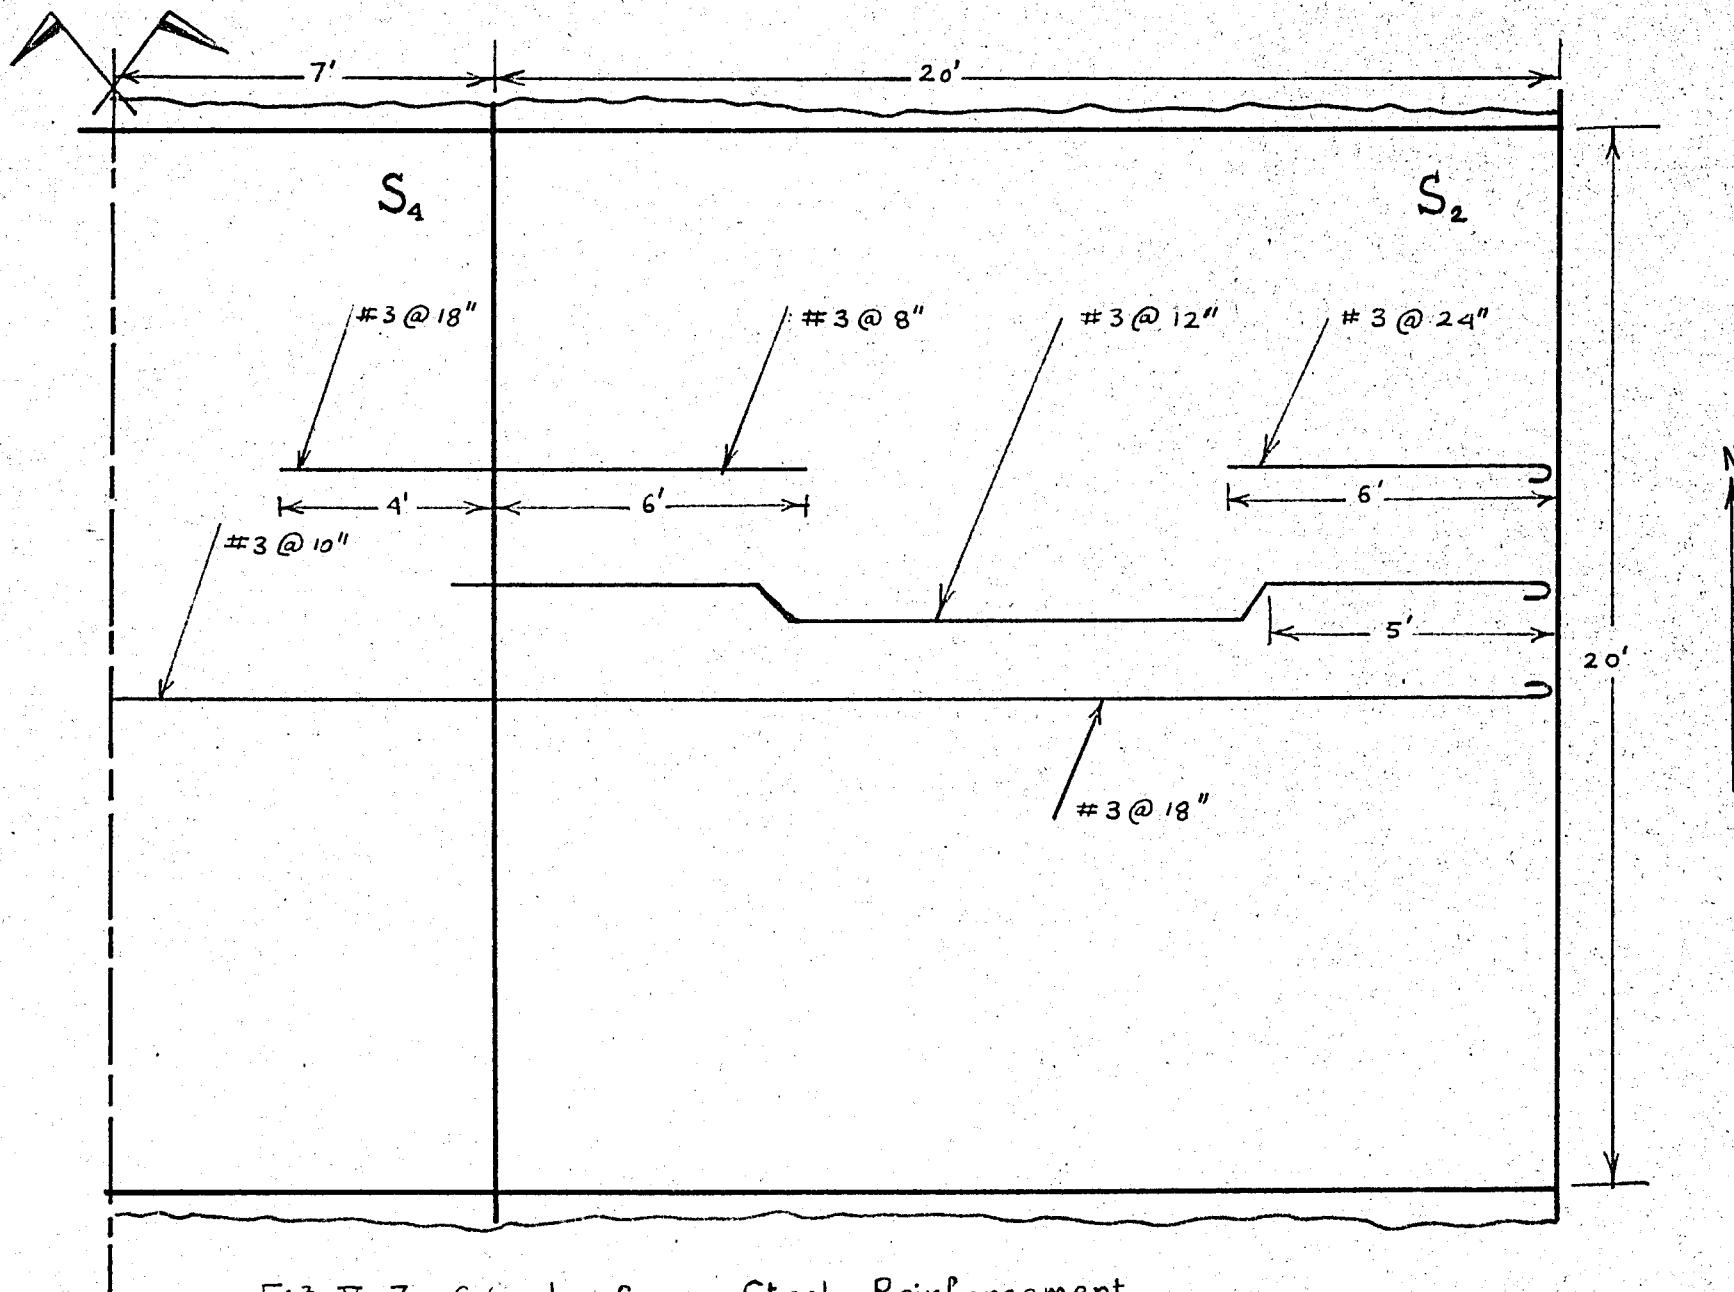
S_2 and S_4 Steel Reinforcement
